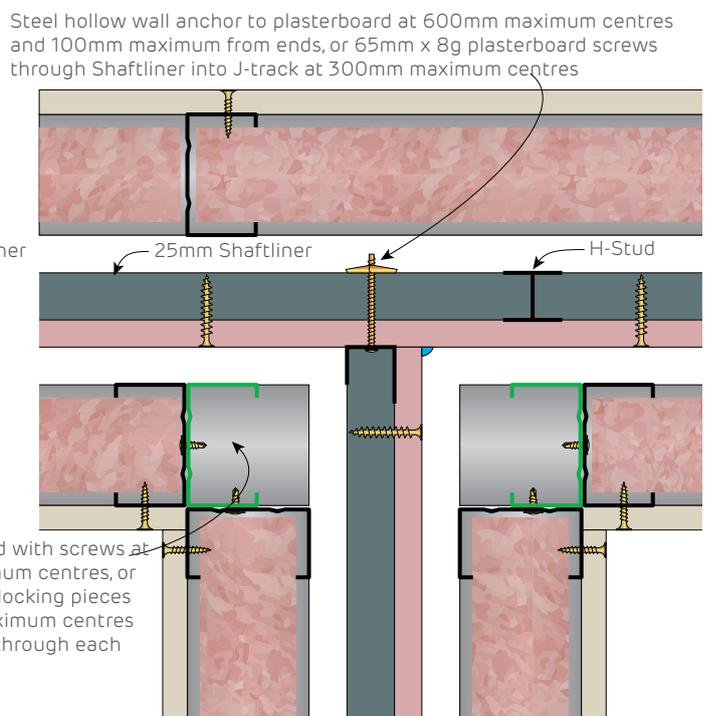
Corridor Wall to Inter-tenancy Wall Junction
